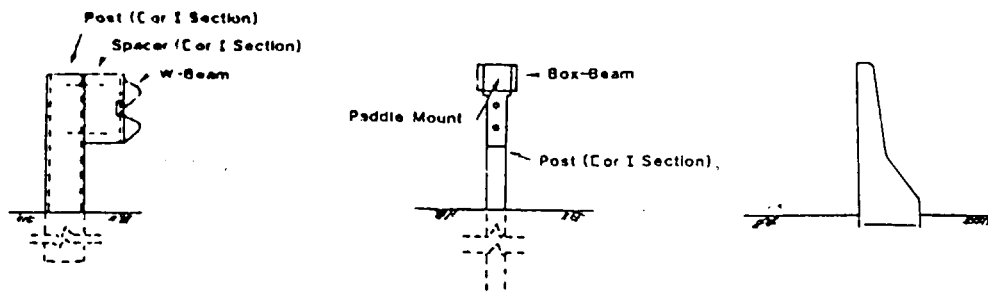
TYPICAL ROADSIDE BARRIERS
